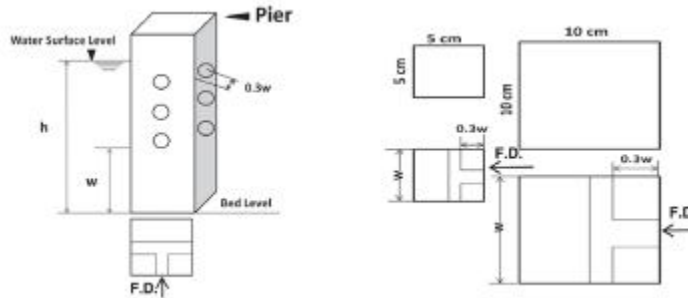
Square pier with opening arrangement (source: National Water Research Centre, Egypt)
